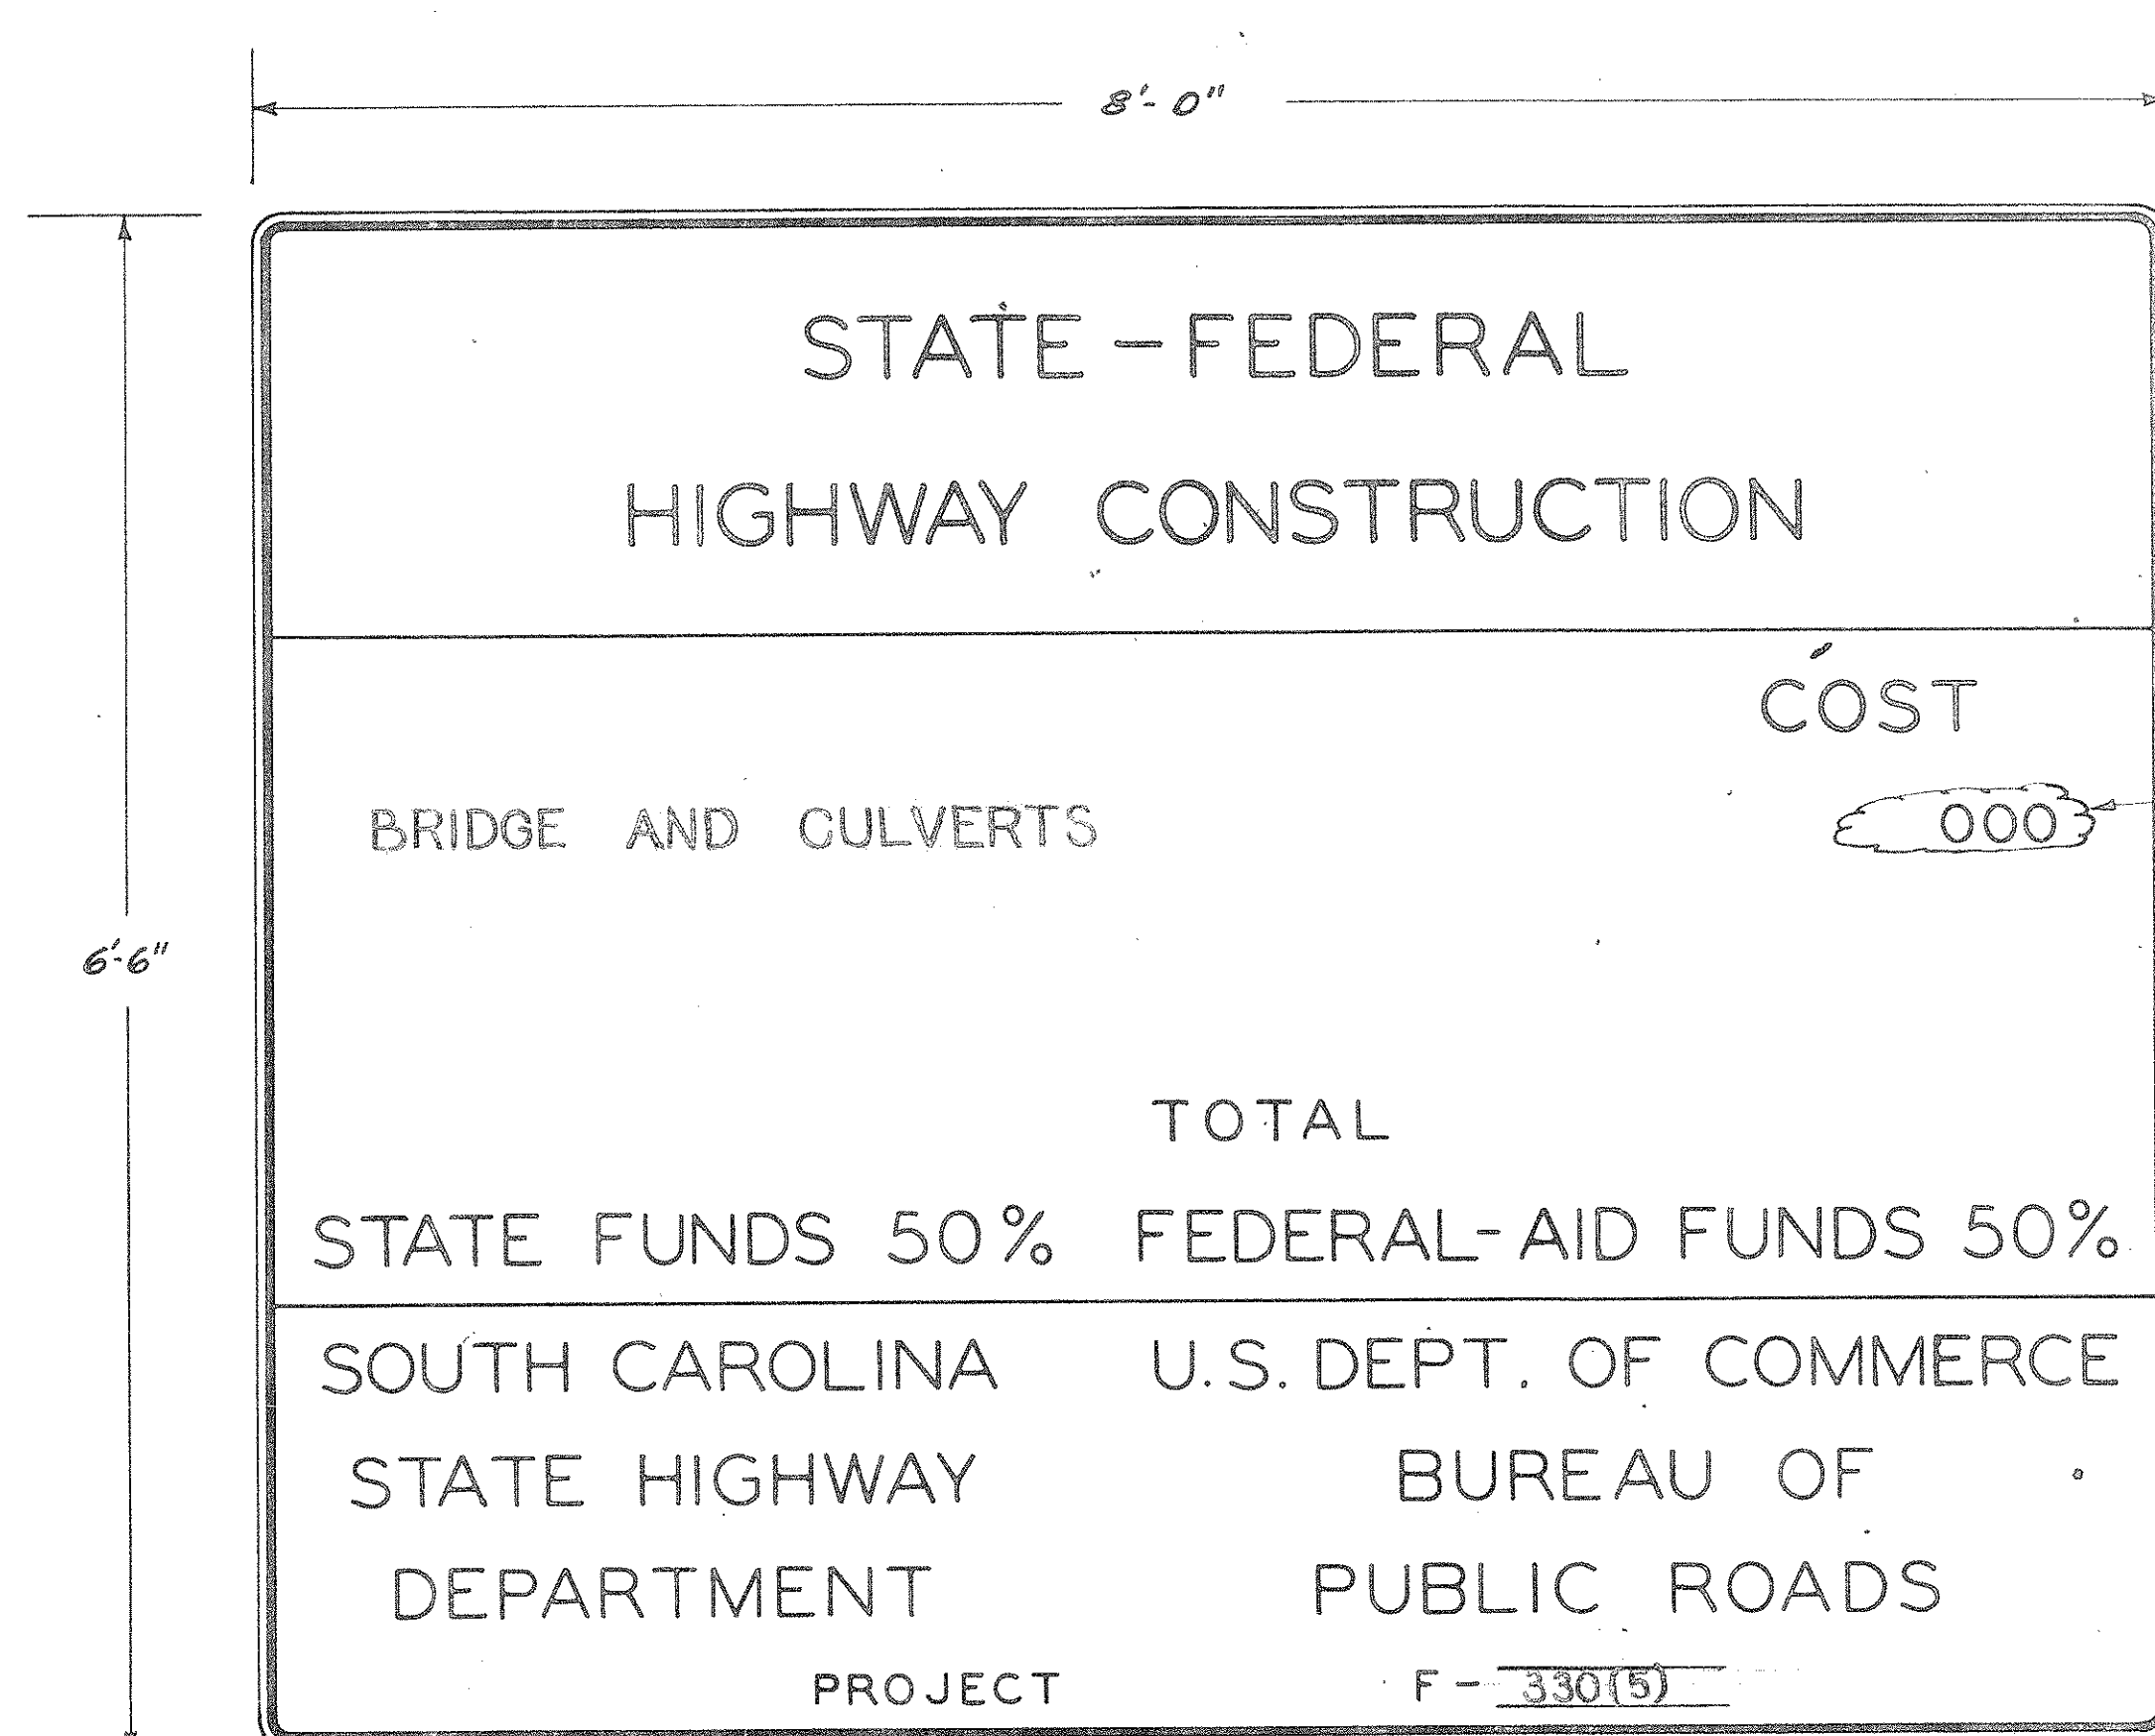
DETAILS SHOWING STANDARD SIGNS, BARRIERS, LIGHTS, AND BARRICADES TO BE FURNISHED, ERECTED, AND MAINTAINED BY THE CONTRACTOR WHERE APPLICABLE ON ALL ROAD OR BRIDGE CONTRACTS
